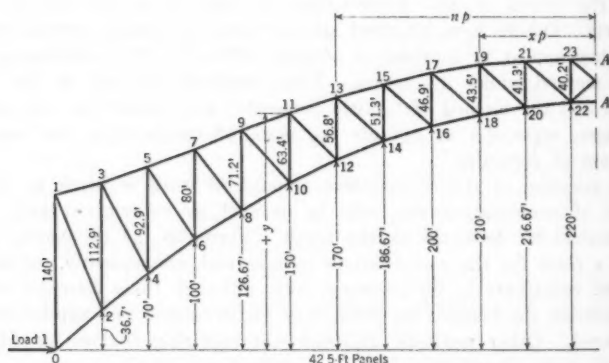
ELEVATION OF HALF ARCH, OVER HELL GATE, NEW YORK, N. Y.
